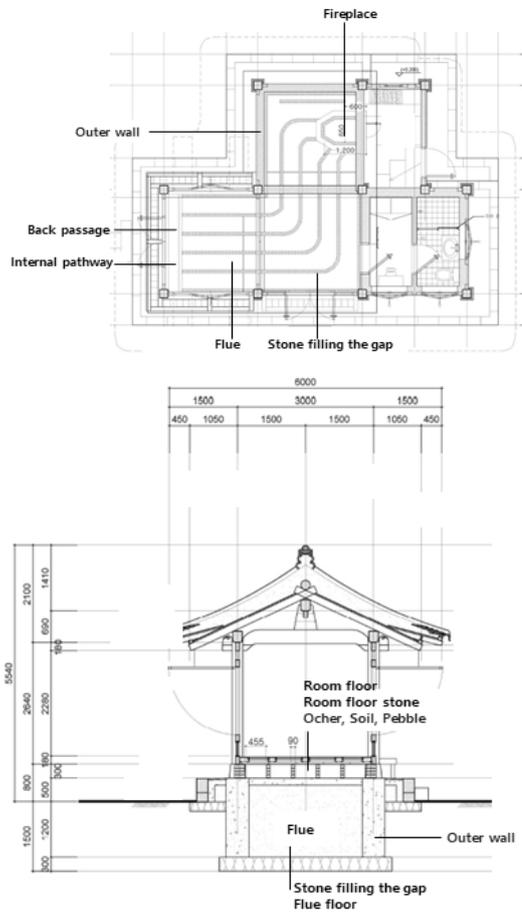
Housing 5 drawing - gudeul plan, Cross-section
